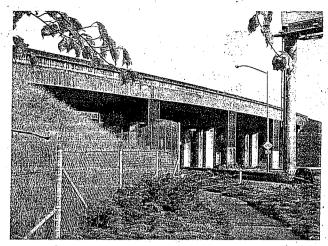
State Route 101 over Wilfred Avenue (Bridge 20-0053)
